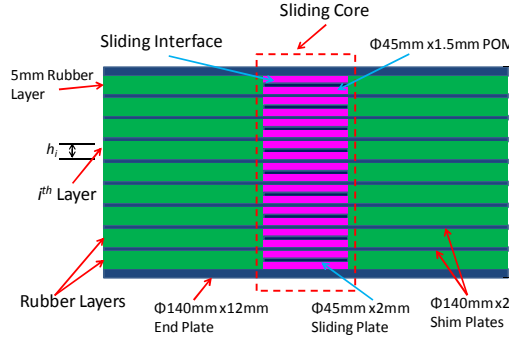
Cross sectional view of adaptive rubber bearing (3 sliding plates in each layer)
